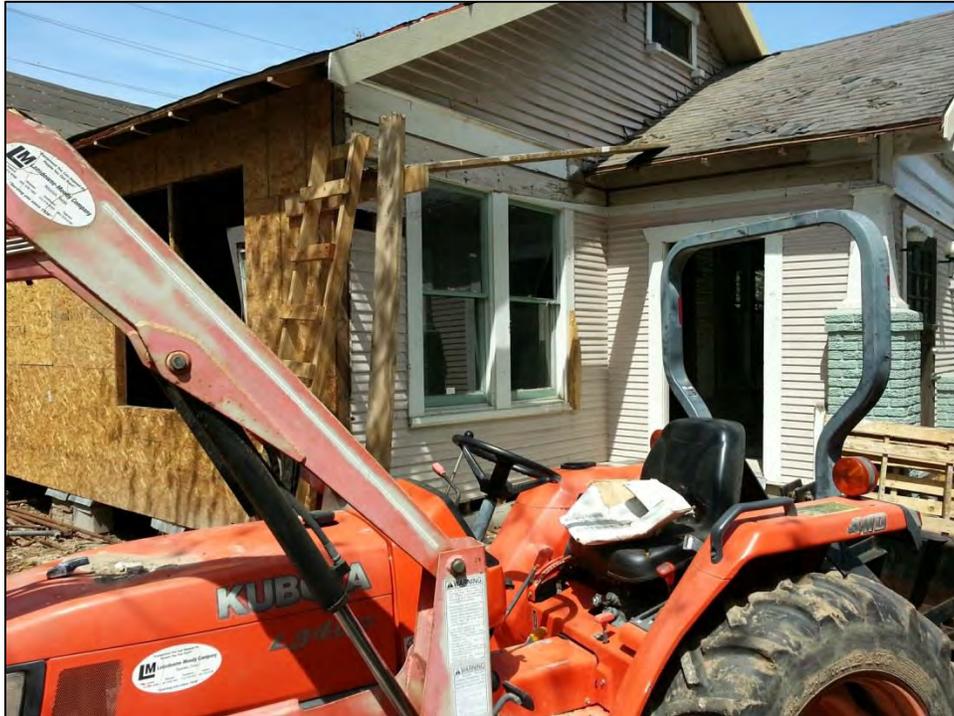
PHOTO SHOWING ORIGINAL DETAILS (TRIM AND BRACKET)
